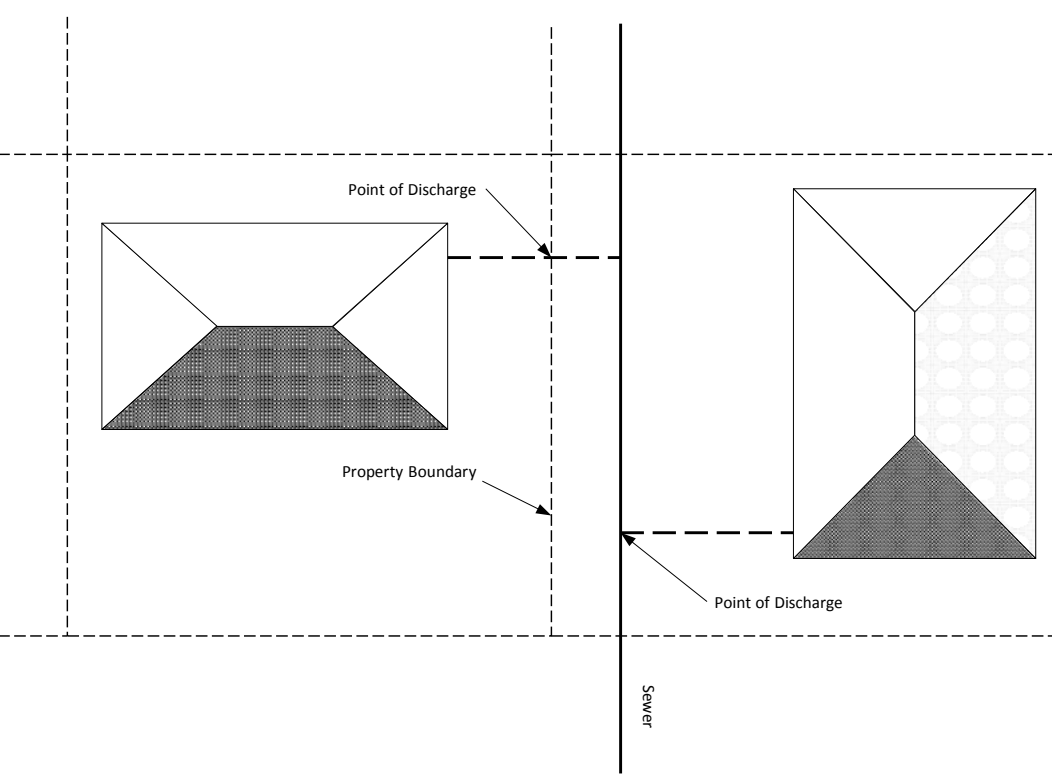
Point of Discharge for a Single Dwelling with Road Frontage
